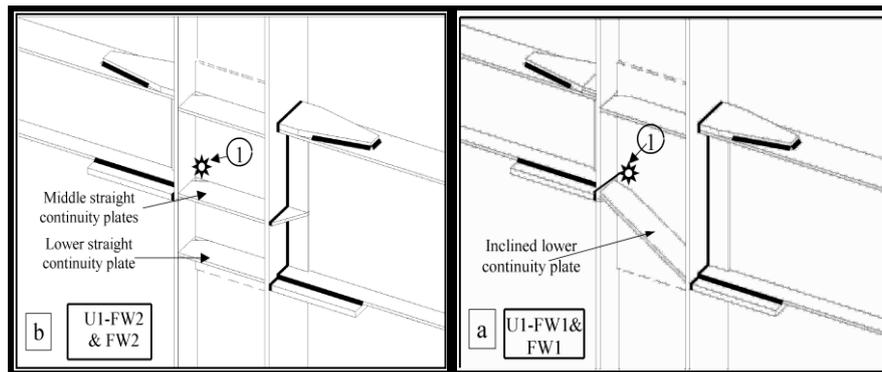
(a) test specimens U1-FW1 and FW-1, and (b) test specimens U1-FW2 and FW2, showing the locations of rosette strain gage(asterisk).
